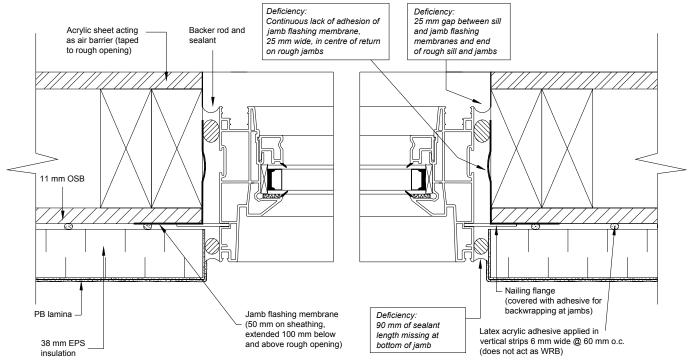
Wall/window interface for specimens No. 6 - horizontal section
